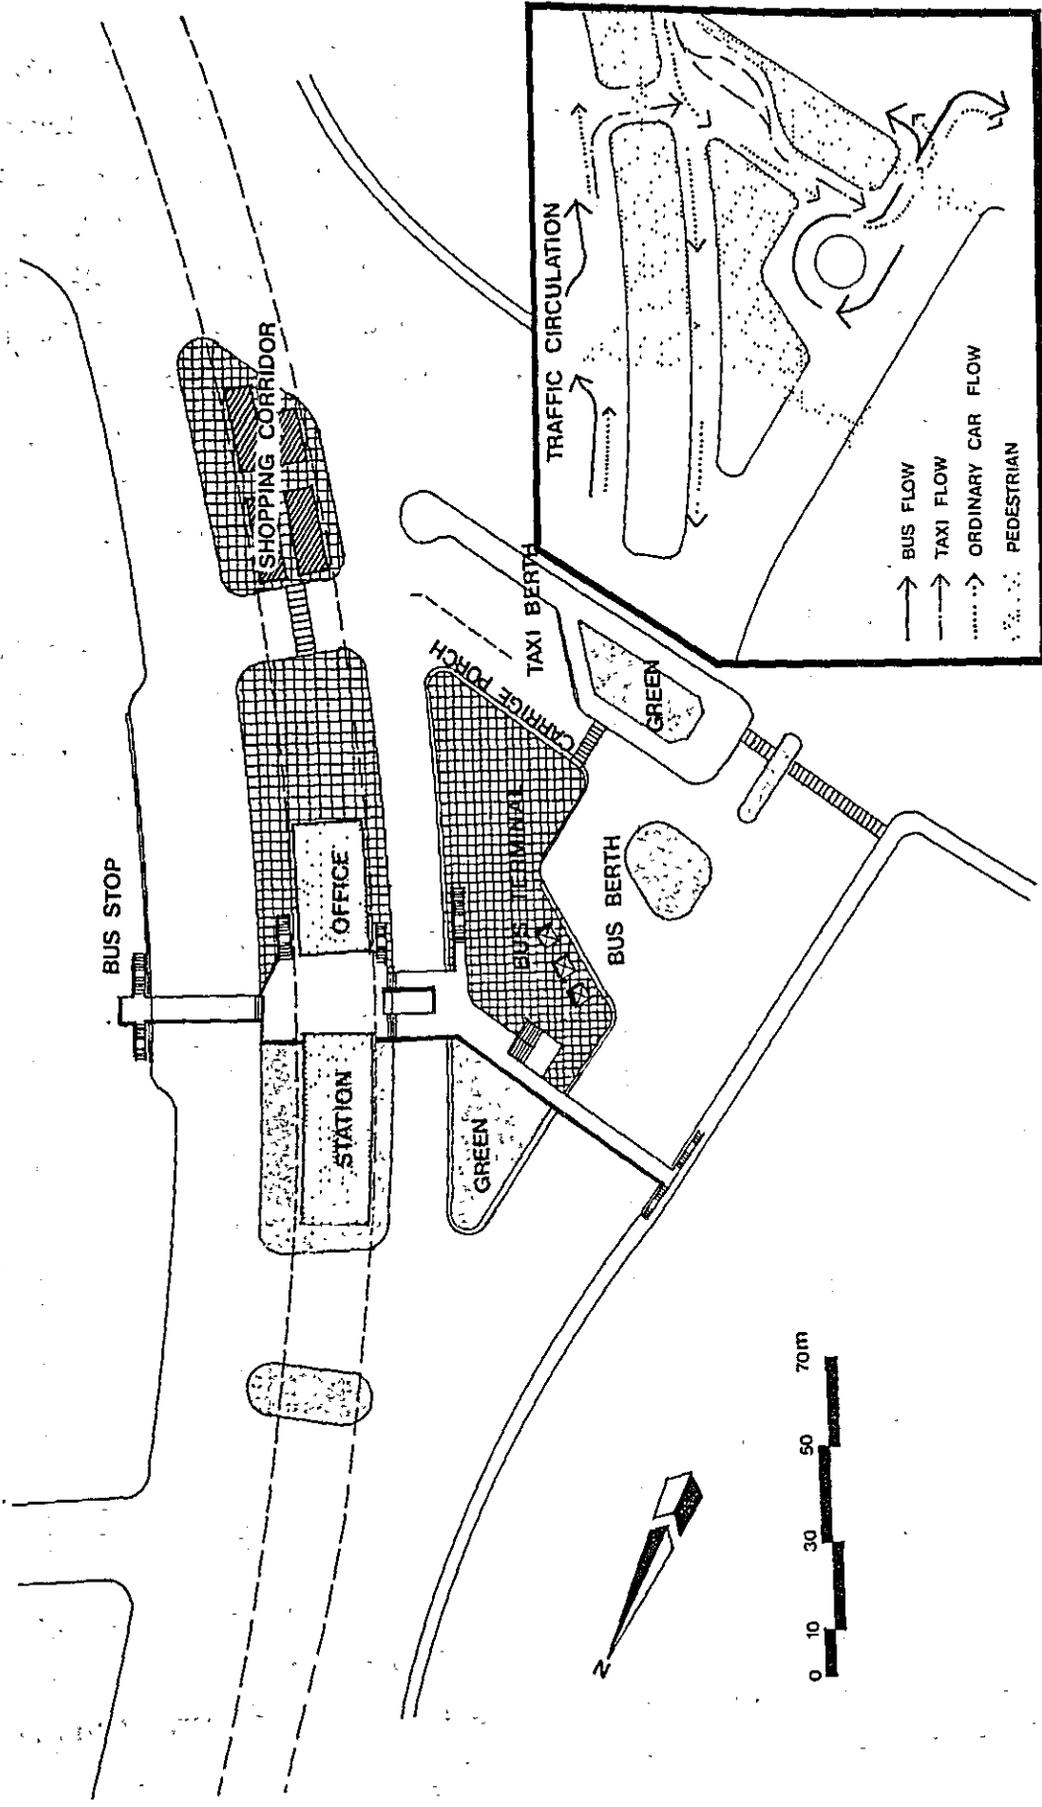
CONCEPTUAL PLAN FOR SAWAH BESAR STATION PLAZA
